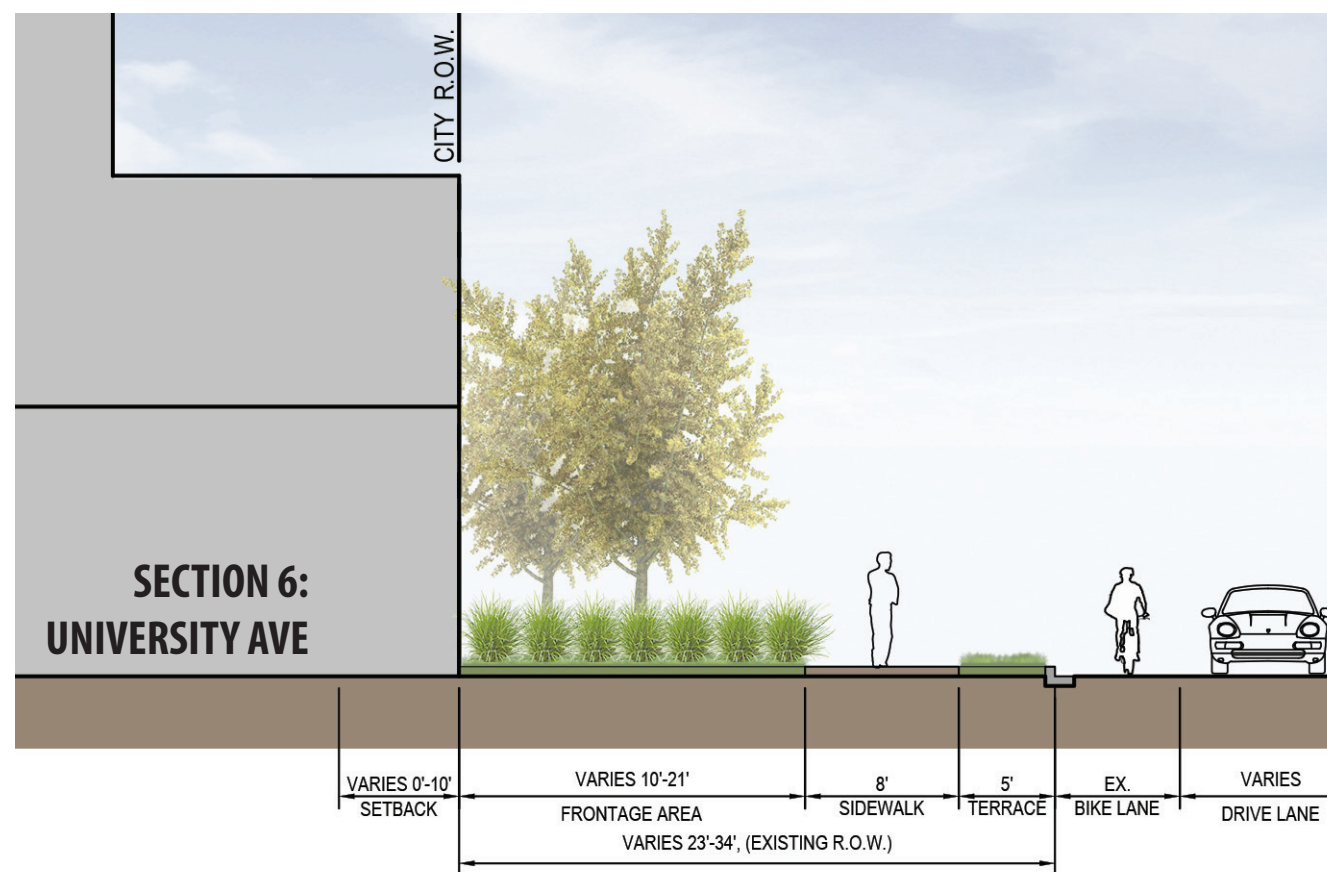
F - PROPOSED STREET SECTIONS - EXTERIOR
